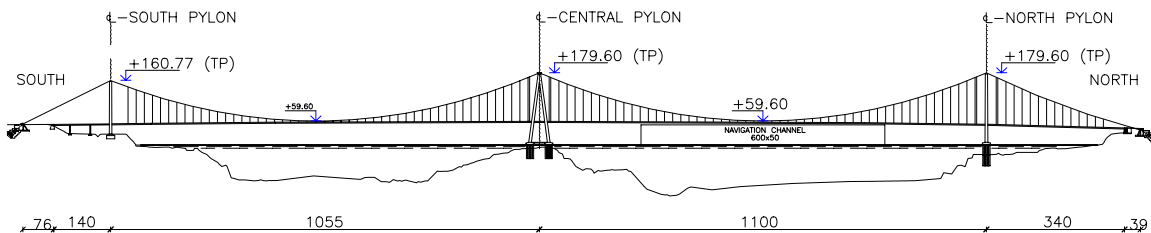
Elevation of the Chacao Bridge. Dimensions in m.
